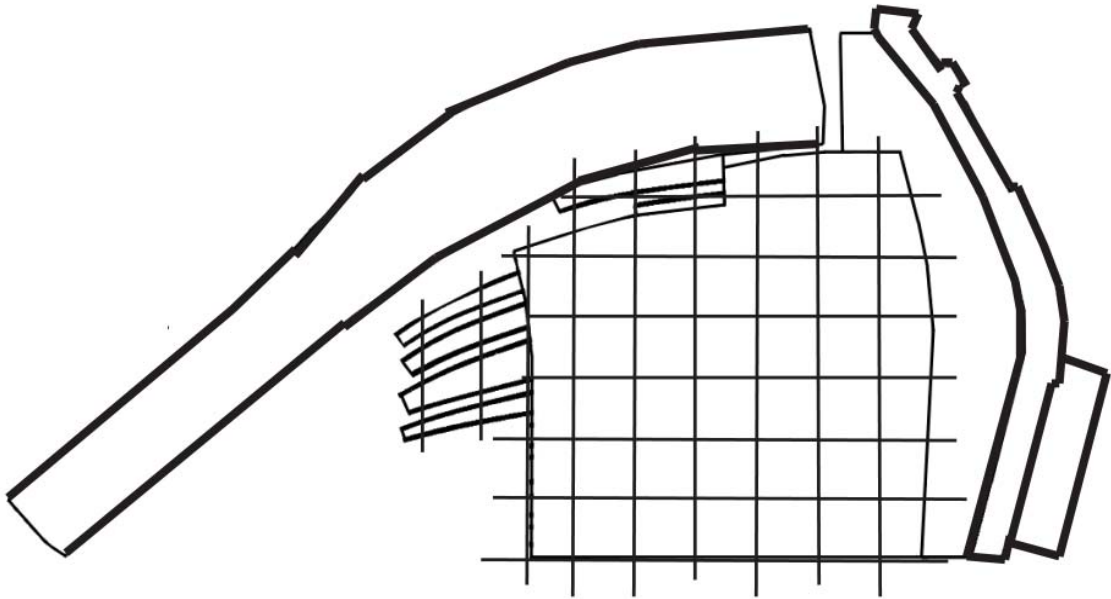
“Waterloo Plan to Elevation”; Steve Martz
